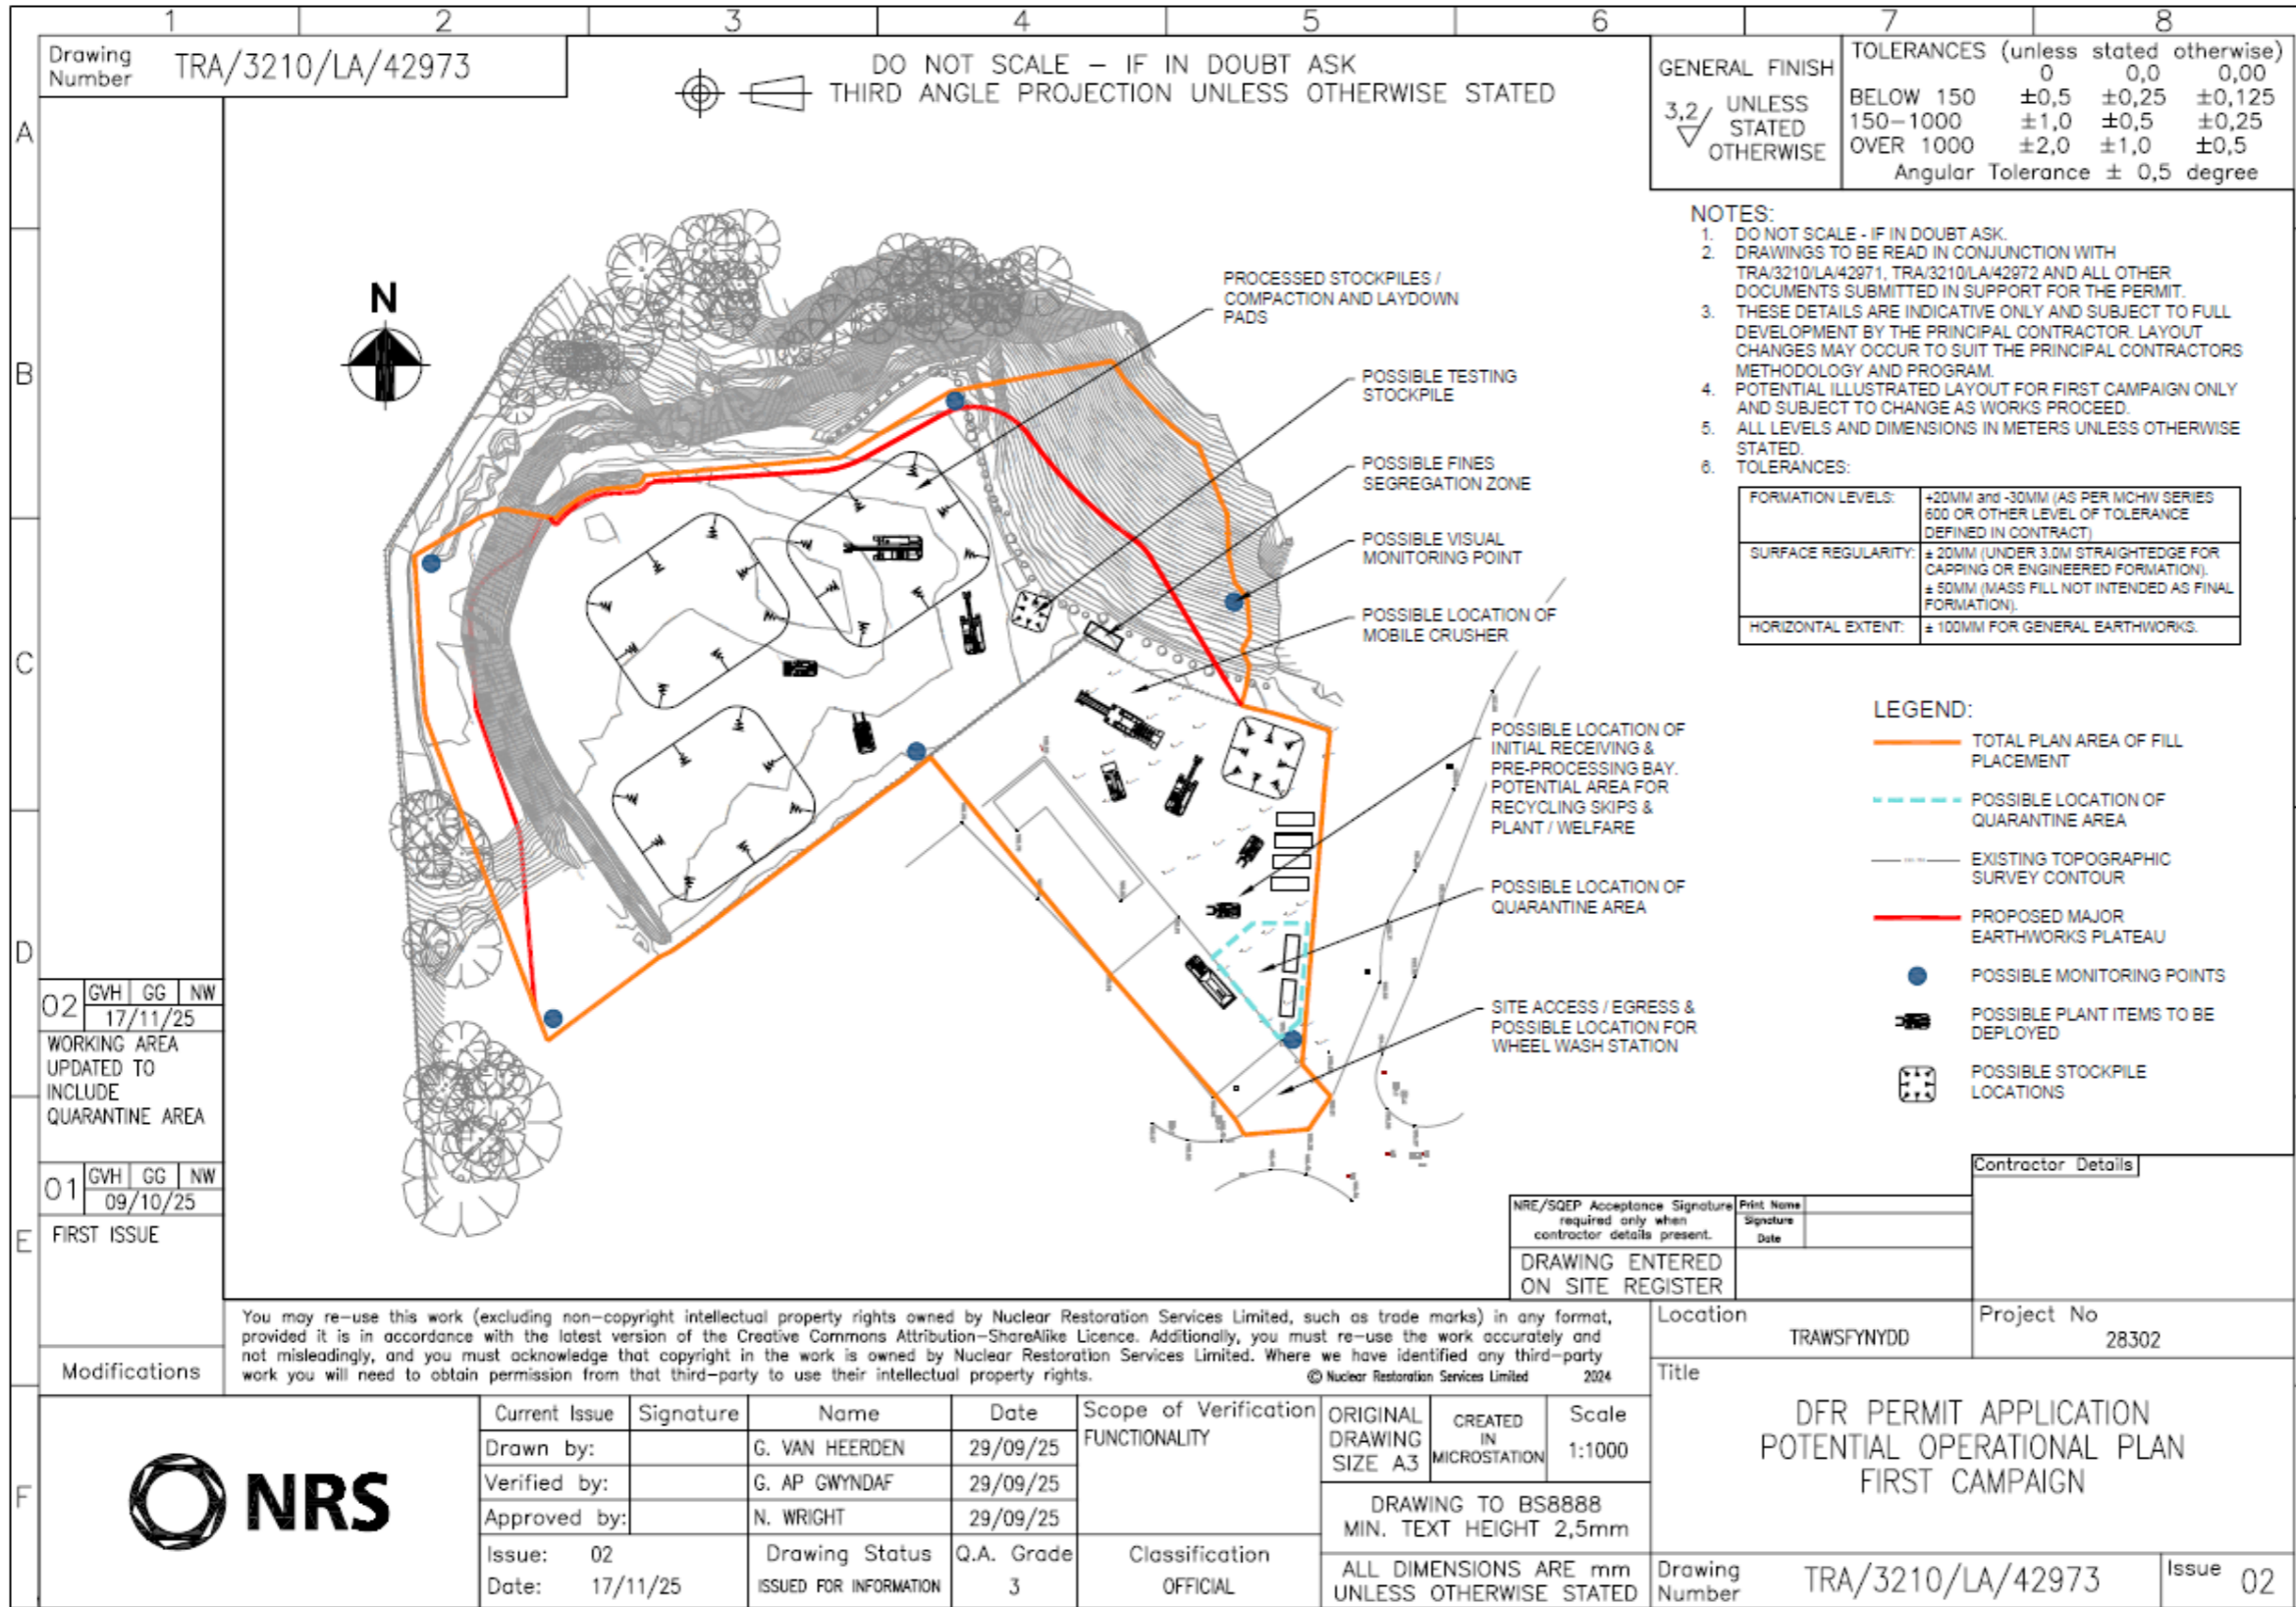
Site Layout, Drawing TRA/3210/LA/42973
